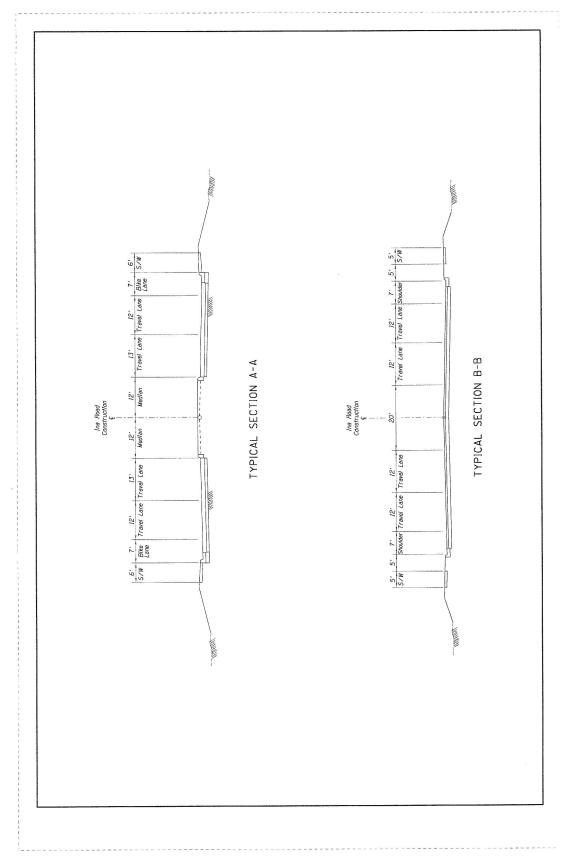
Ina Road typical sections east of I-10 (A-A) and west of I-10 (B-B)
